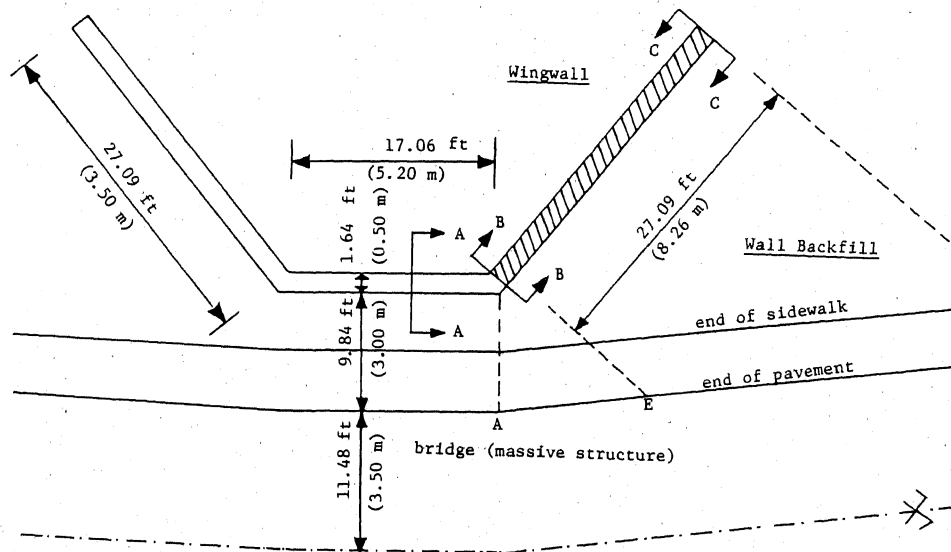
PLAN VIEW OF THE WINGWALL AND ADJACENT STRUCTURES
